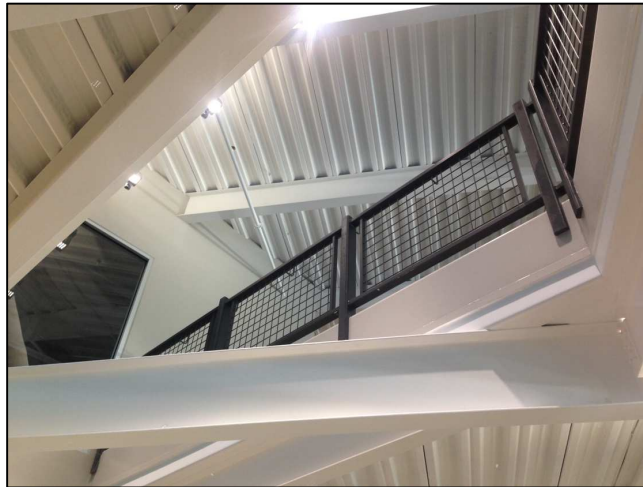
11 m² opening in ceiling of first floor laboratory space leading directly to the second floor office area.
